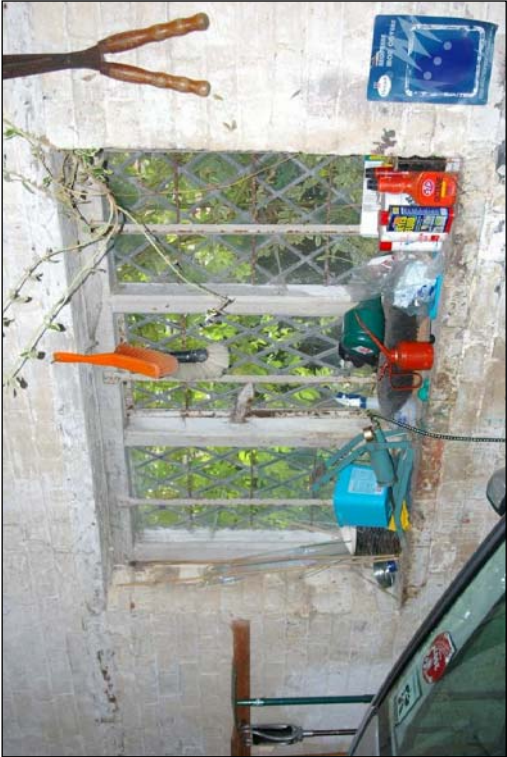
p4: Internal view of ground floor window in south-east elevation.
